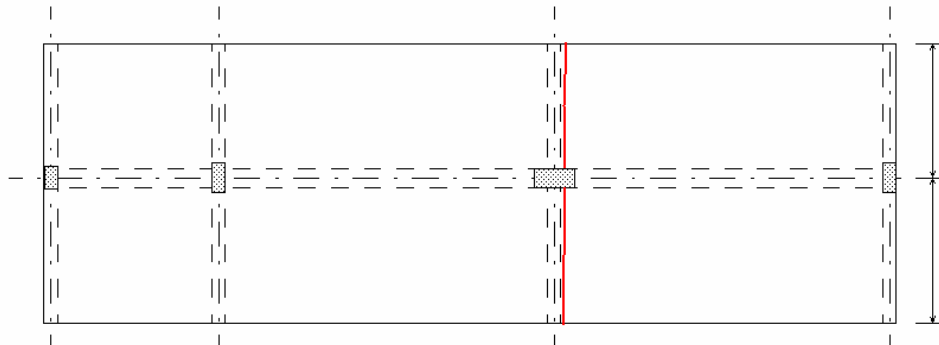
Slab damage pattern after the infill frame tests
